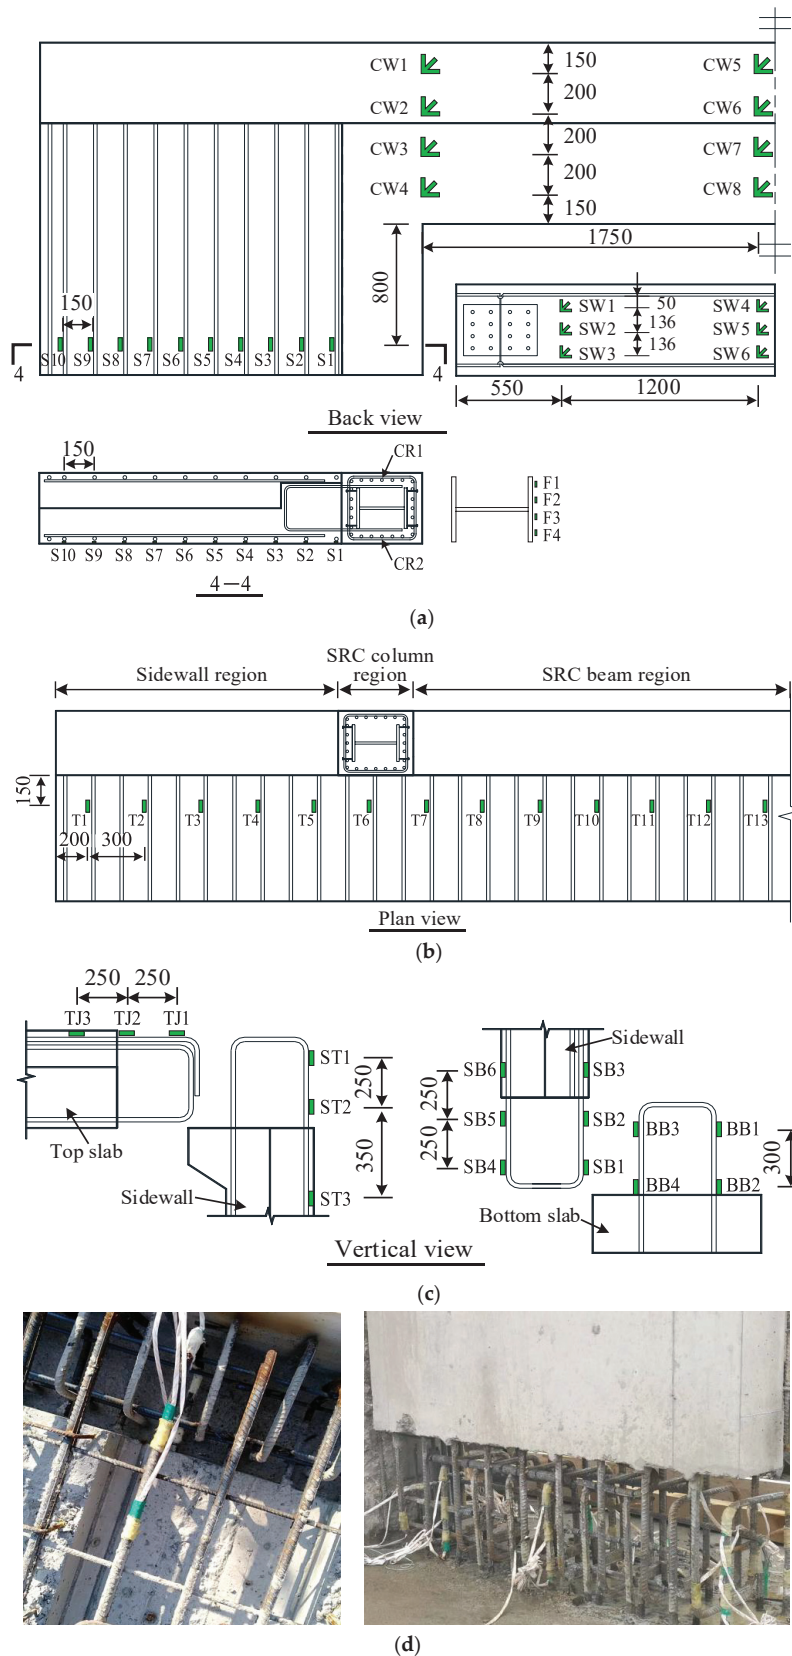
Arrangement of strain gauges (units: mm): (a) strain-gauge layout in sidewall and entrance frame, (b) strain-gauge layout in the top slab, (c) strain-gauge layout in the U-type rebar overlapping connections, and (d) photograph of strain gauge arrangement at U-type rebar overlapping connections.
